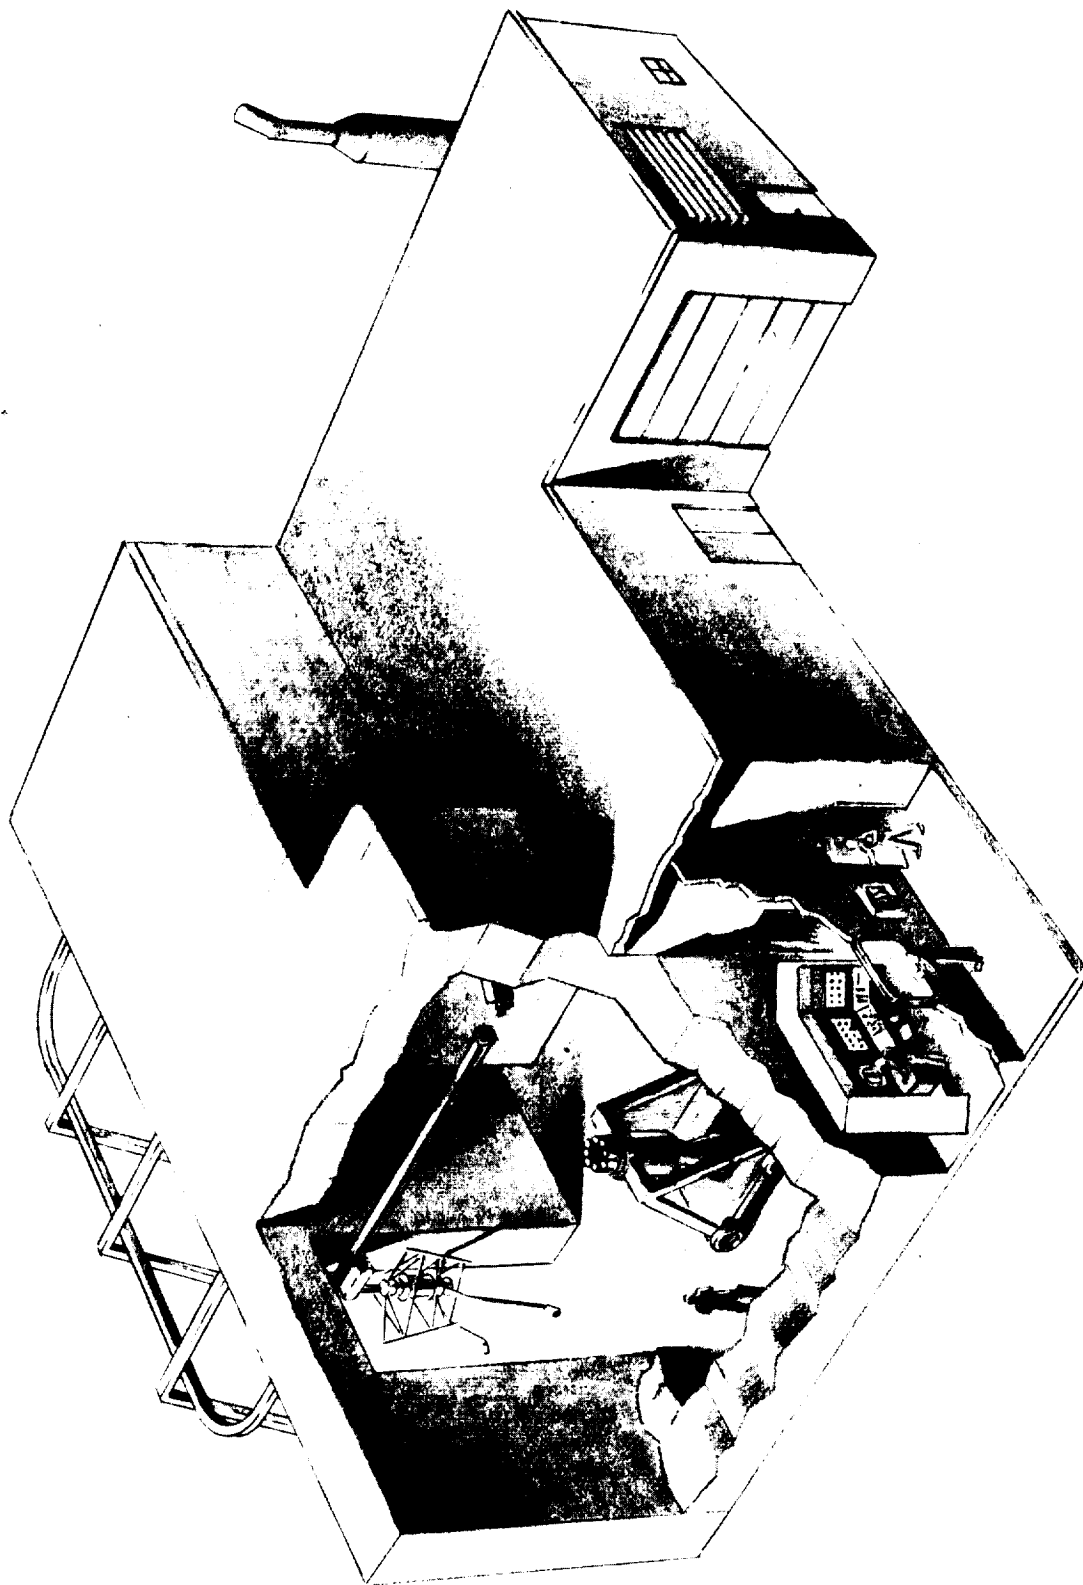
Saturn-RIFT Nuclear Engine Assembly and Checkout
